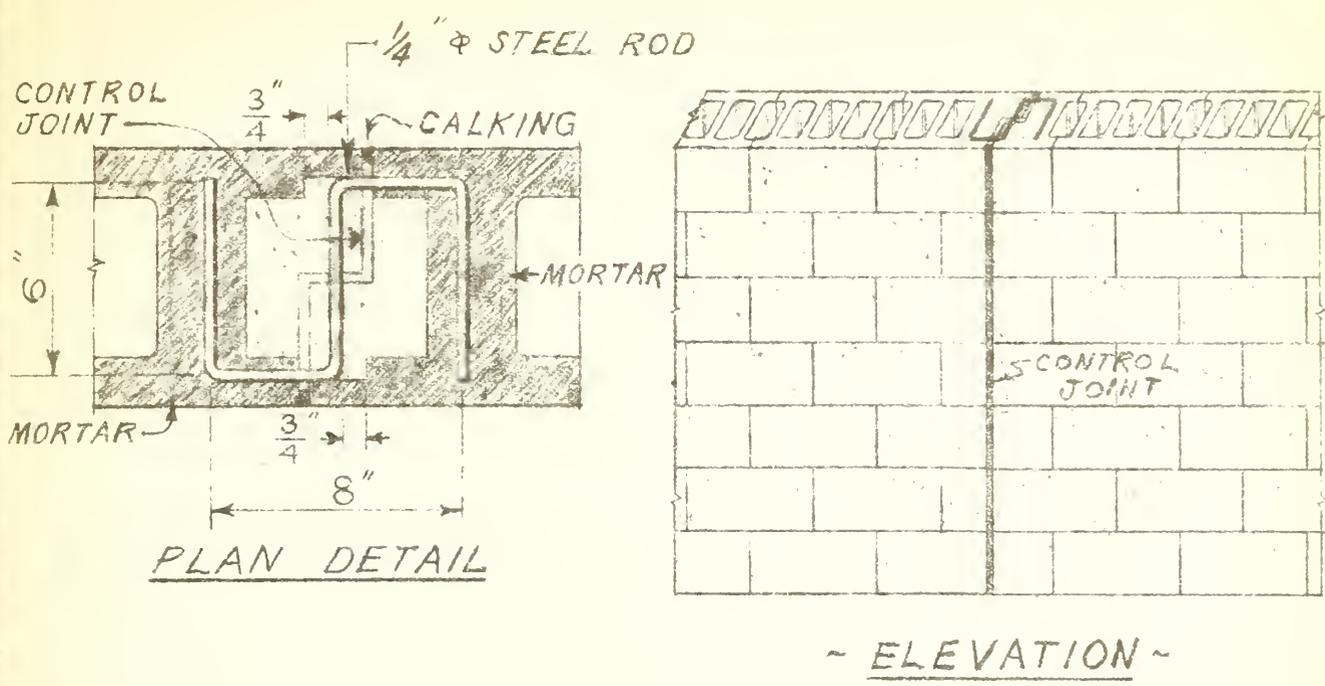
TYPICAL CONTROL JOINT USING STANDARD STOCK STRETCHER BLOCK AND CONCRETE CORE.
